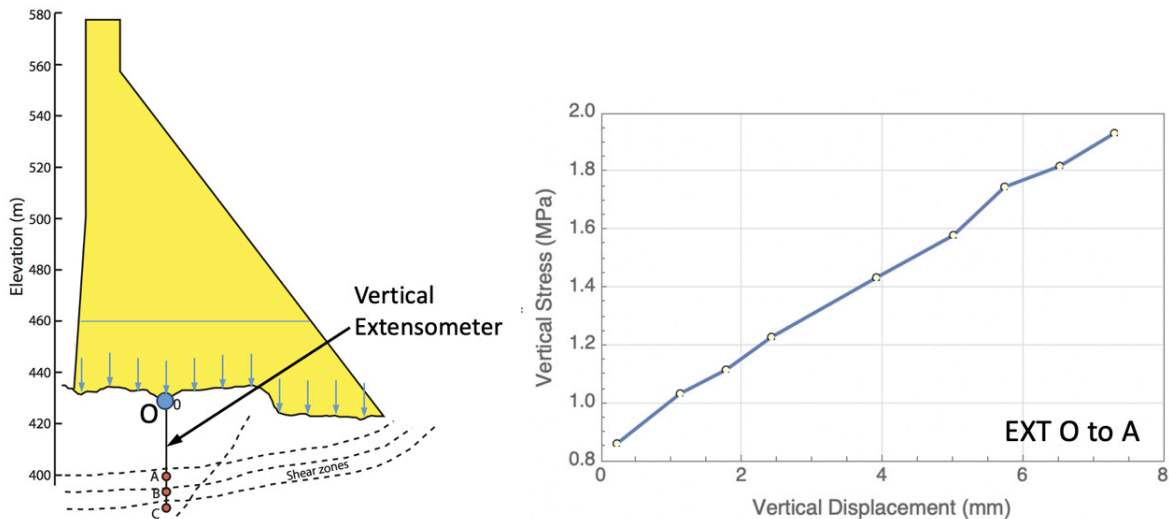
Location of the vertical multipoint extensometer beneath the dam foundation, and the measured vertical displacement and the vertical stress applied by the concrete dam at O as construction progressed.
